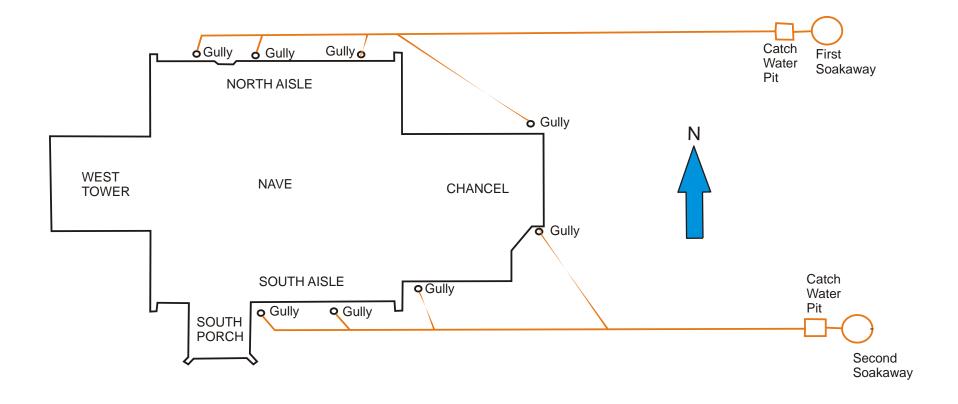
Tracing of a Plan of the Intended Groundworks based on Architects plan (no scale)
